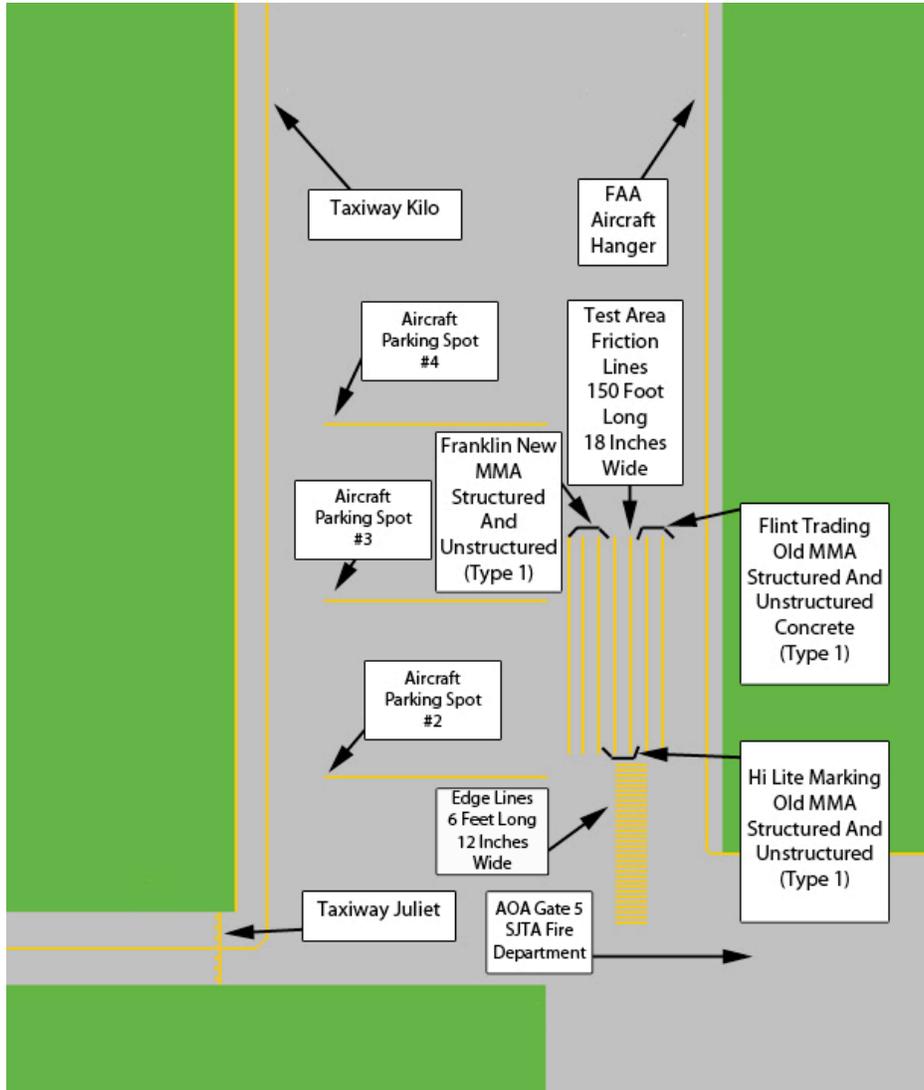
Layout of Test Stripes on the FAA Ramp (Concrete)
